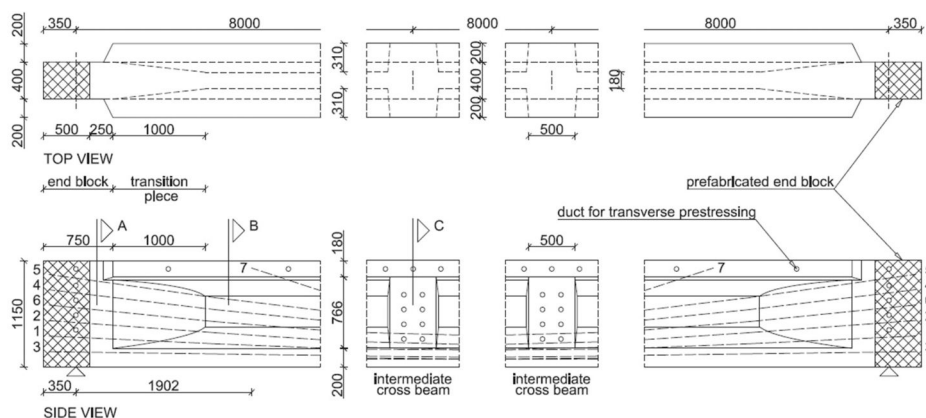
Detail of draped tendon layout in T-girder (dimensions in mm) (Ensink et al., 2024).
